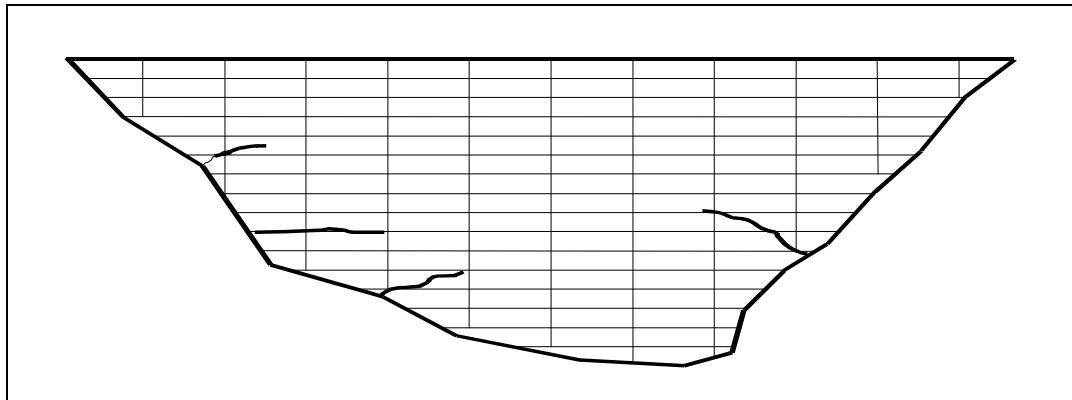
Existing arch dam with vertical contraction joints, horizontal lift joints, and pre-existing cracks
